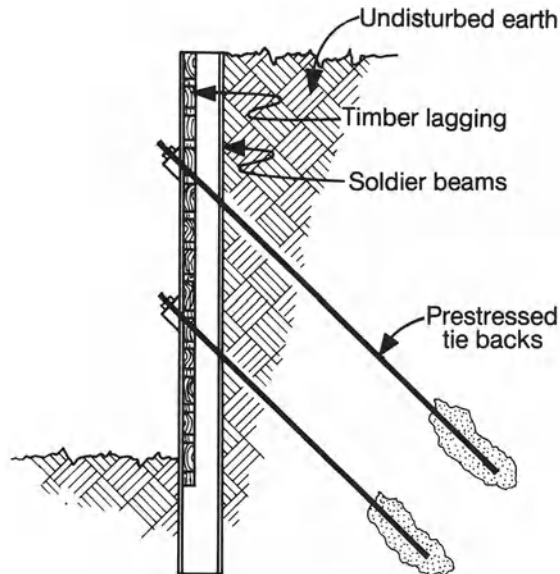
Typical detail of a soldier beam retaining wall.
